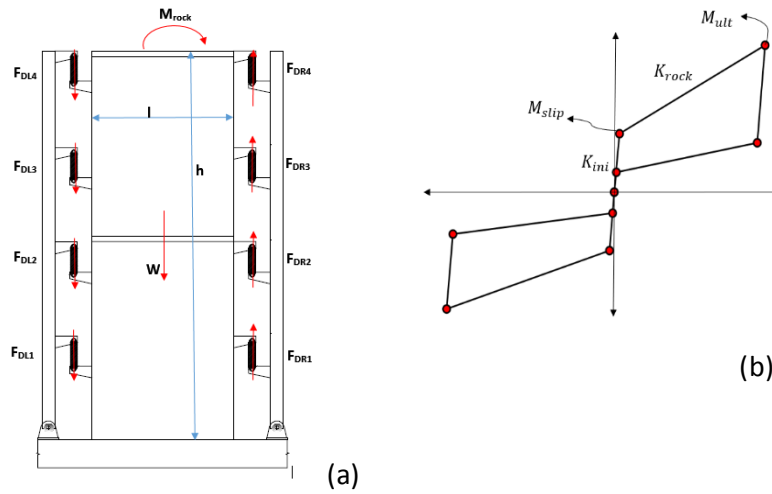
(a) Schematic of single wall system (b) general push-pull of rocking wall with RSFJ
